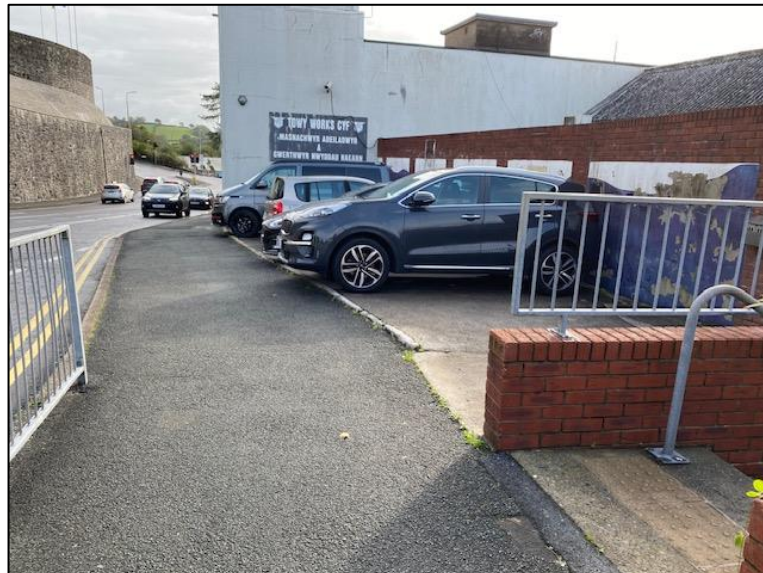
front apron off northern façade to Coracle Way being used for car parking against reception projection, with Towy Works in background
